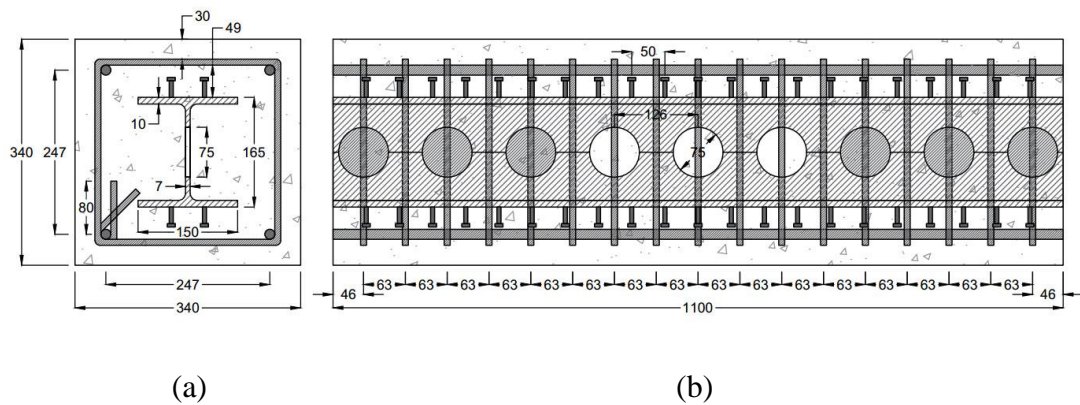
Reinforcement details of C2s-63, C2s-63-E1 and C2s-63-E2 columns; (a) cross-section; and (b) longitudinal section (dimensions in mm).
